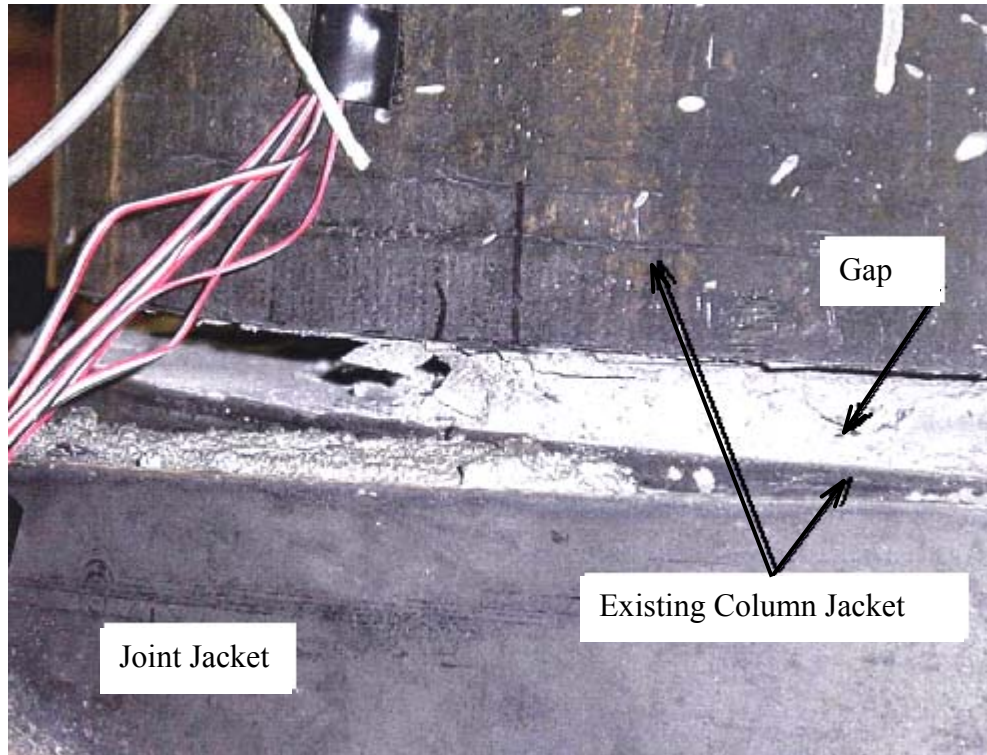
Spalling off Concrete at Column Corners for Specimen RSI
